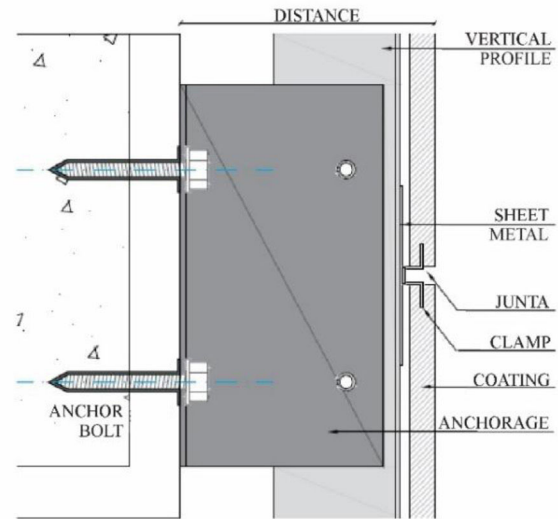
Detail of the ELIANETEC clamp fixing system.
